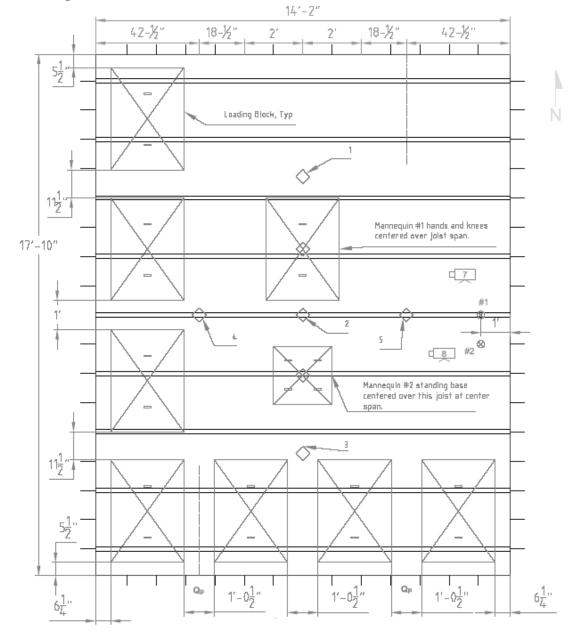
Loading and Instrumentation Layout (See Figure A.4.8).
